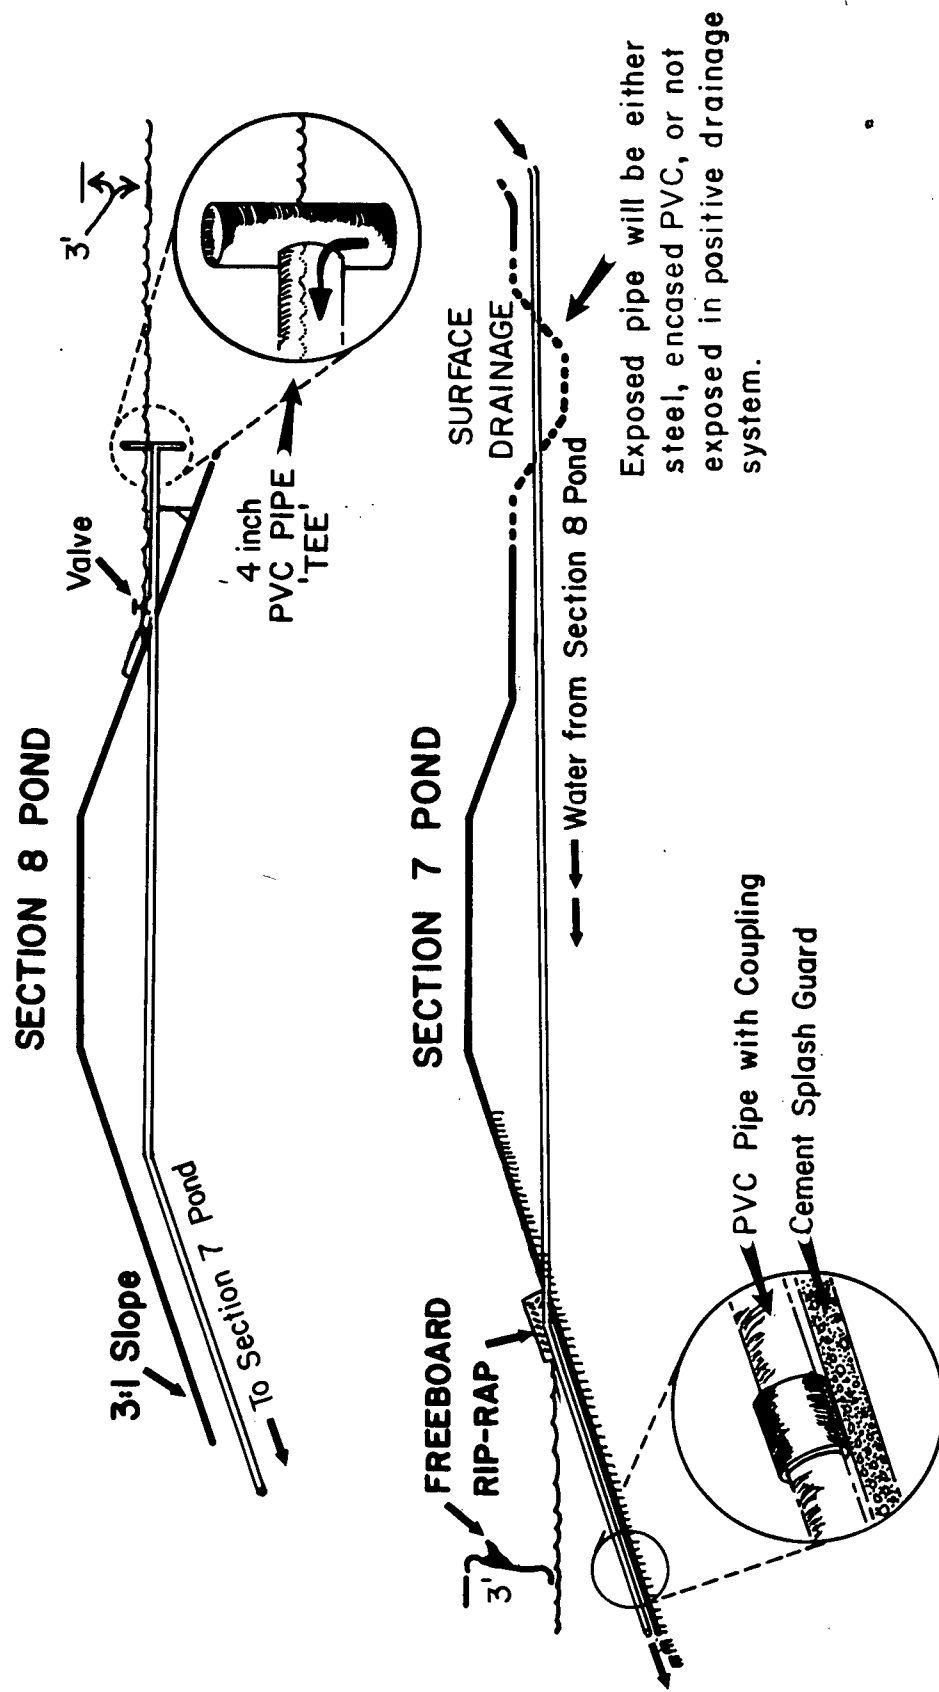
Cross section of ponds showing transfer of water from pit 8 to 7.
